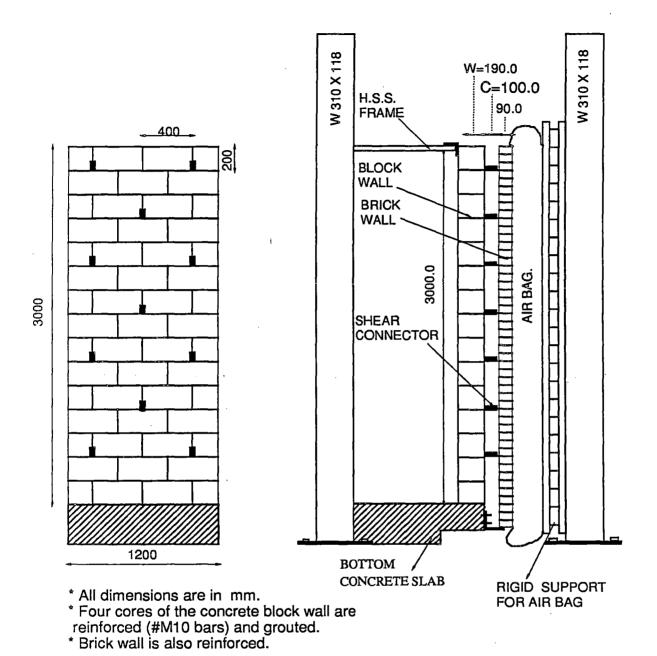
Specimen Description and Testing Apparatus (S2W3)
